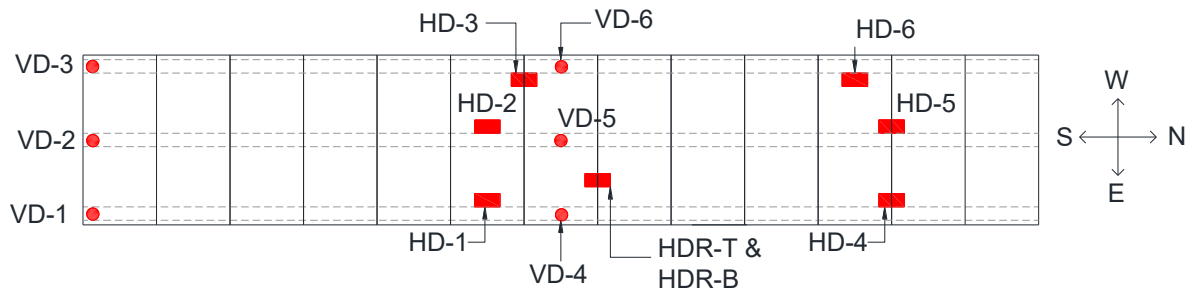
LVDT Installation Plan for Fatigue Testing of Glulam Timber Girder Bridge
